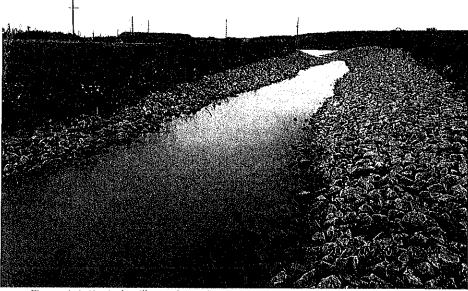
Activated spill way from the South Dam Seep Collection Sump 2 pond.
